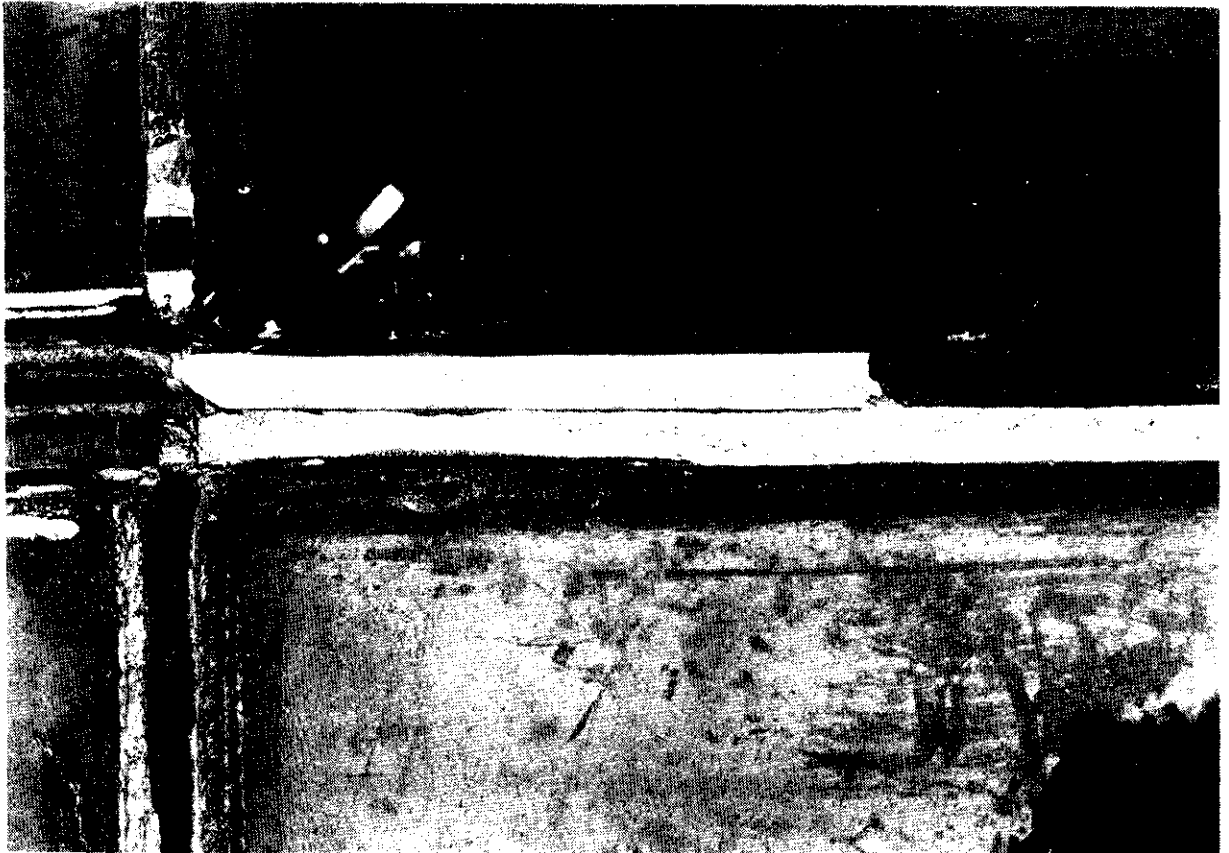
Specimen 28: Fracture patterns in deck and doubler
